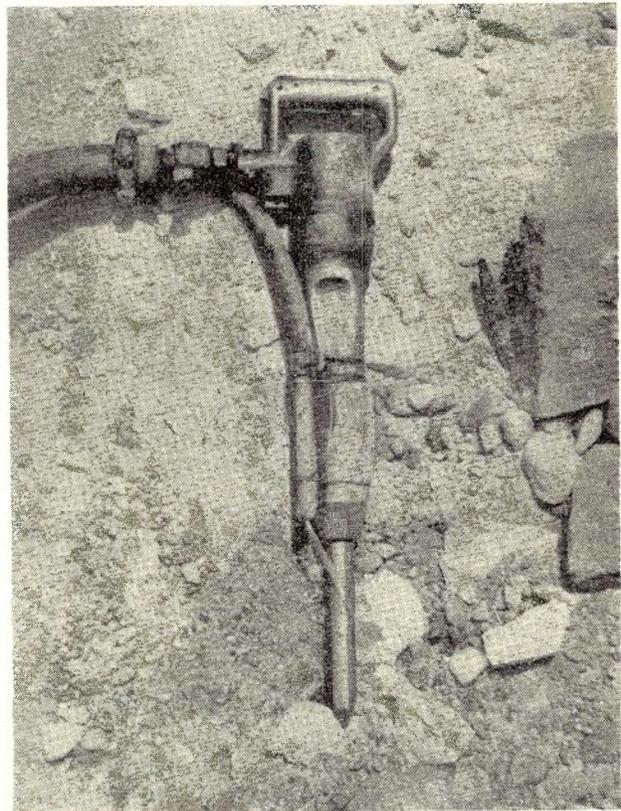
Pneumatic Pick with improvised spray attachment.
